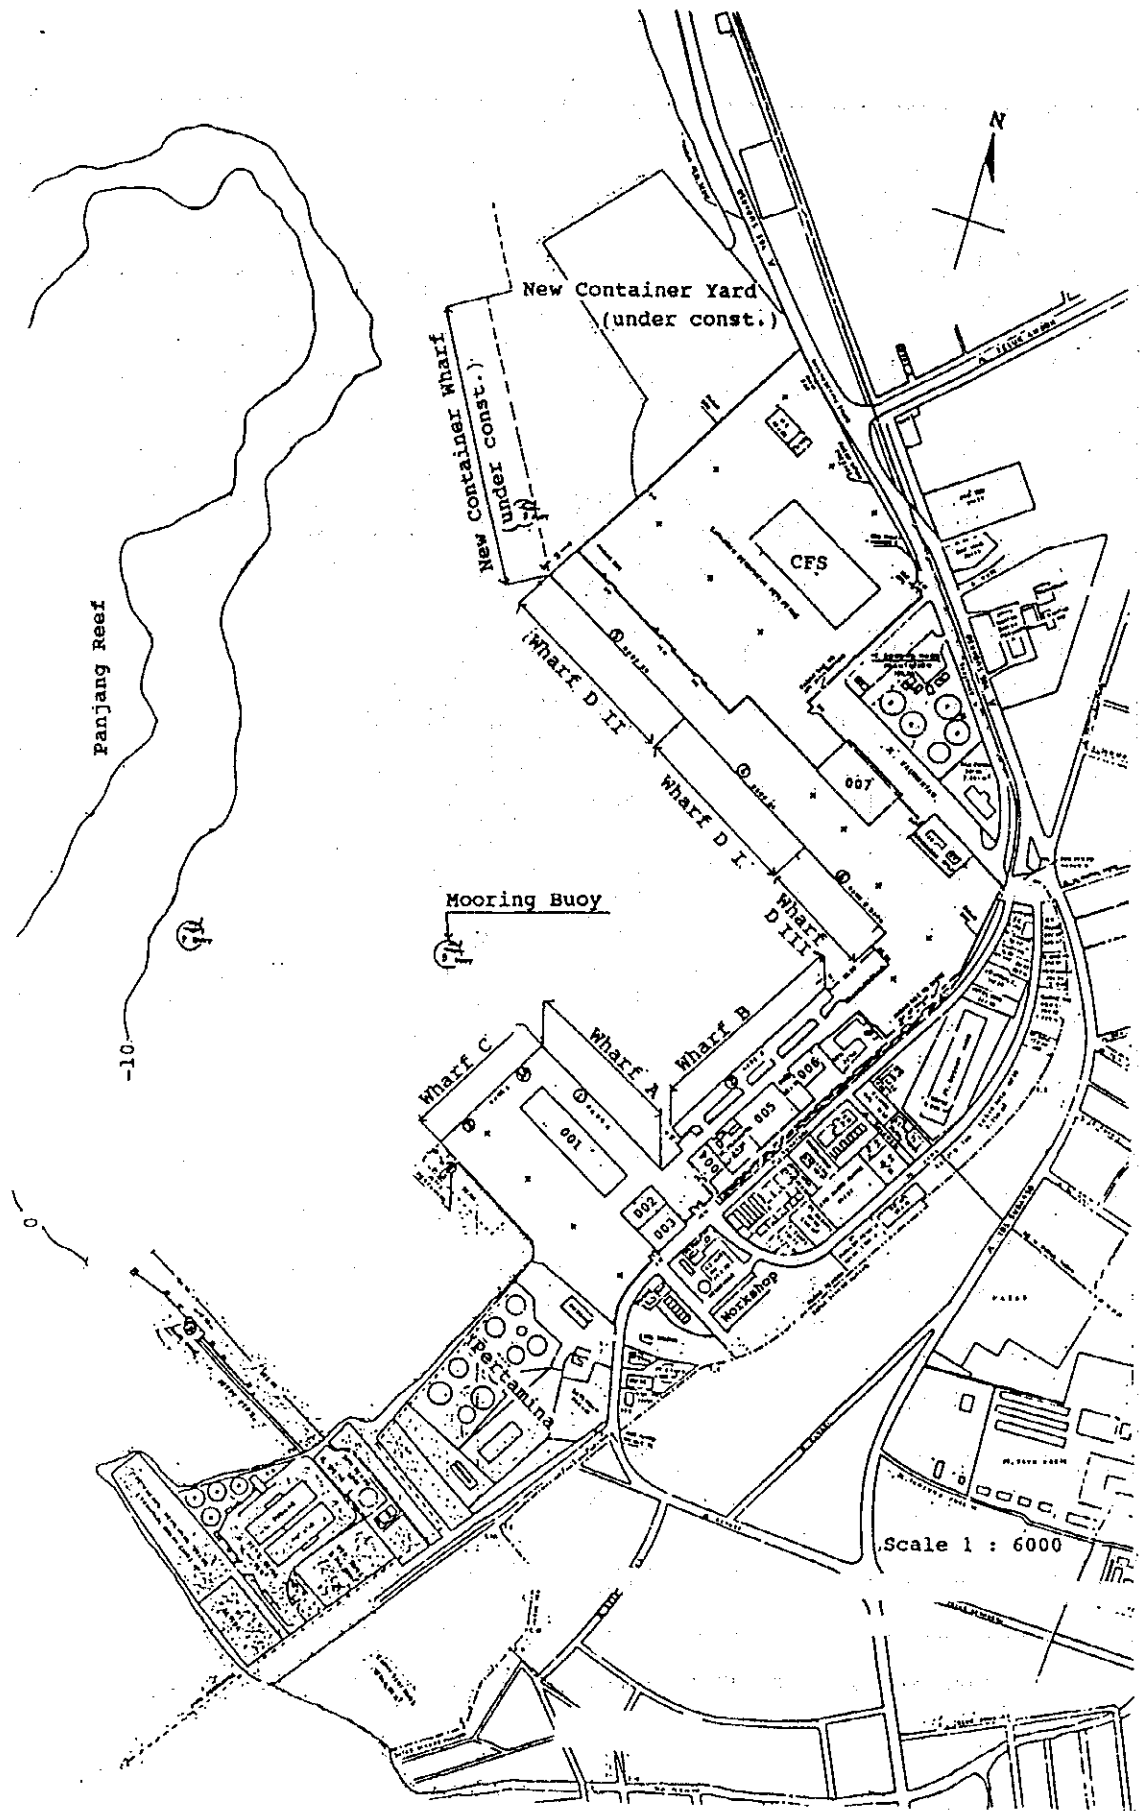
General Plan of Port of Panjang, Bandar Lampung
